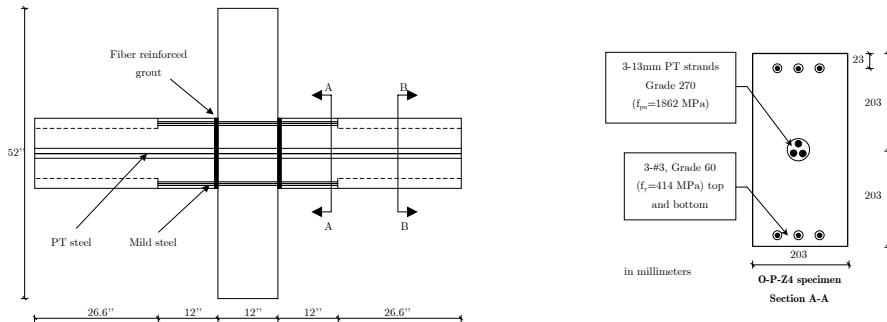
Specimen and beam section reinforcement details (Cheok et al., 1994).
